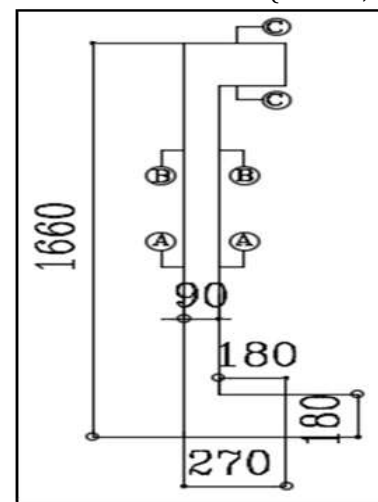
Concrete Dimension for Eccentrically Loaded Columns (UHPC2, UHPC3)
